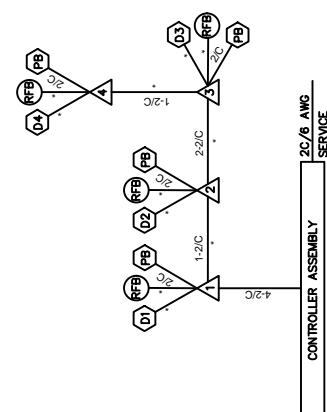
DETAIL - RAPID FLASHING BEACON ASSEMBLY
